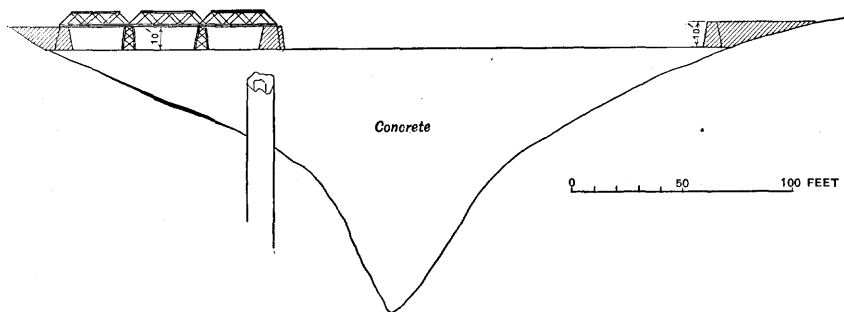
Elevation of concrete overflow dam, Briscoe reservoir.
